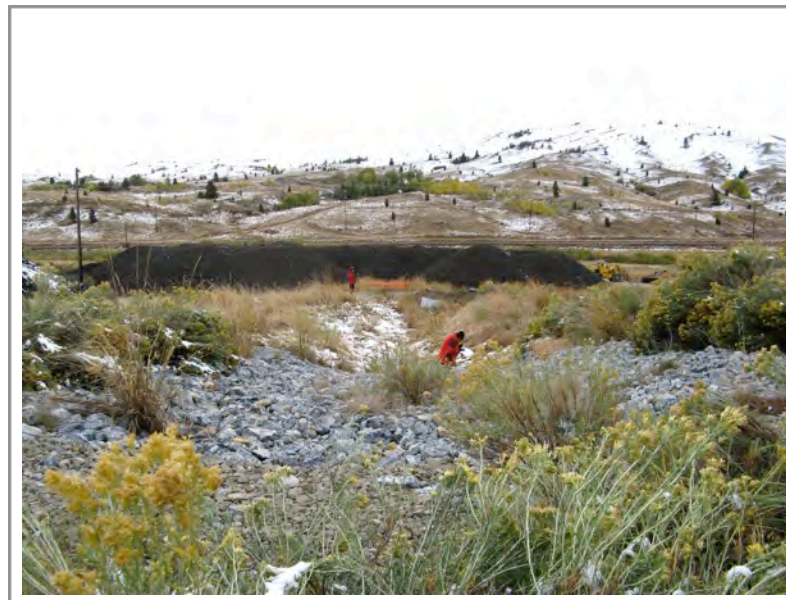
MWRR—looking downstream (south) from the emergency spillway of the east pond
